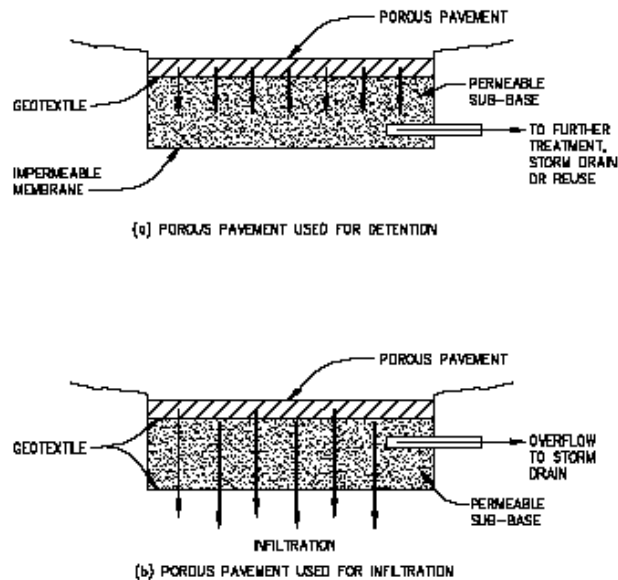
Cross-sections of typical permeable pavement installations. Source, City of Sacramento.
